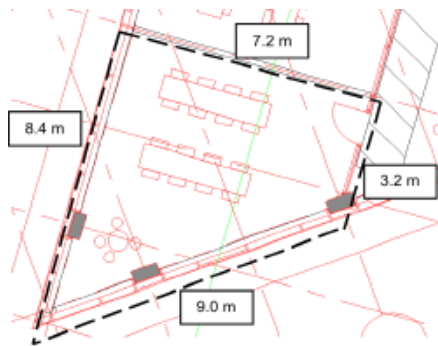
Plan view of office. Furniture layout reflects potential meeting room
